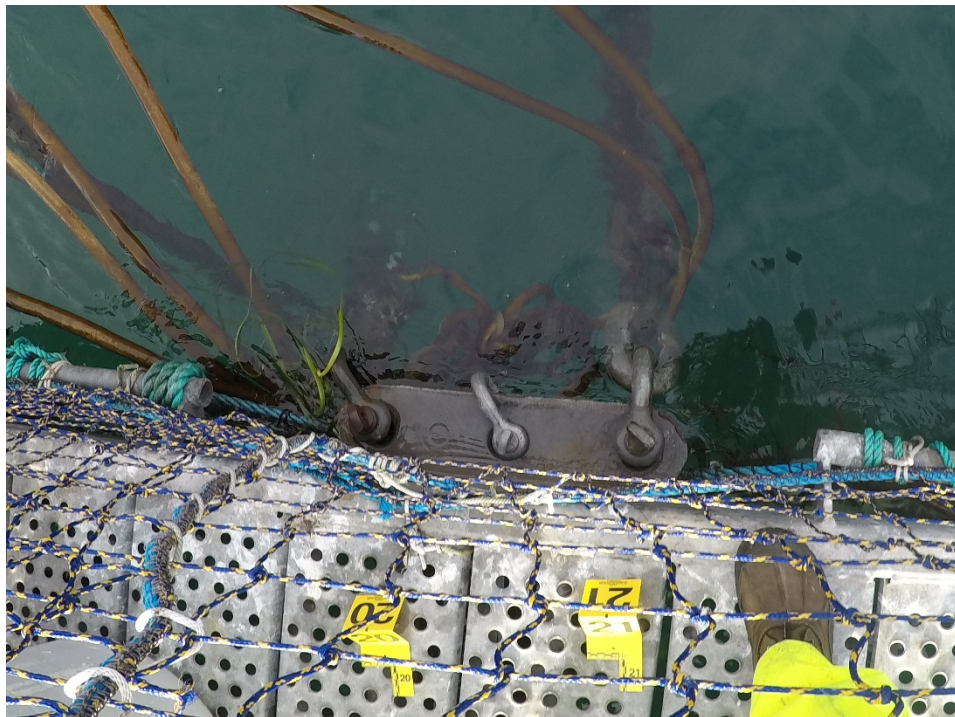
Cypress Island Net Pen Site 3 – Connection at Anchor Lines 20 and 21
